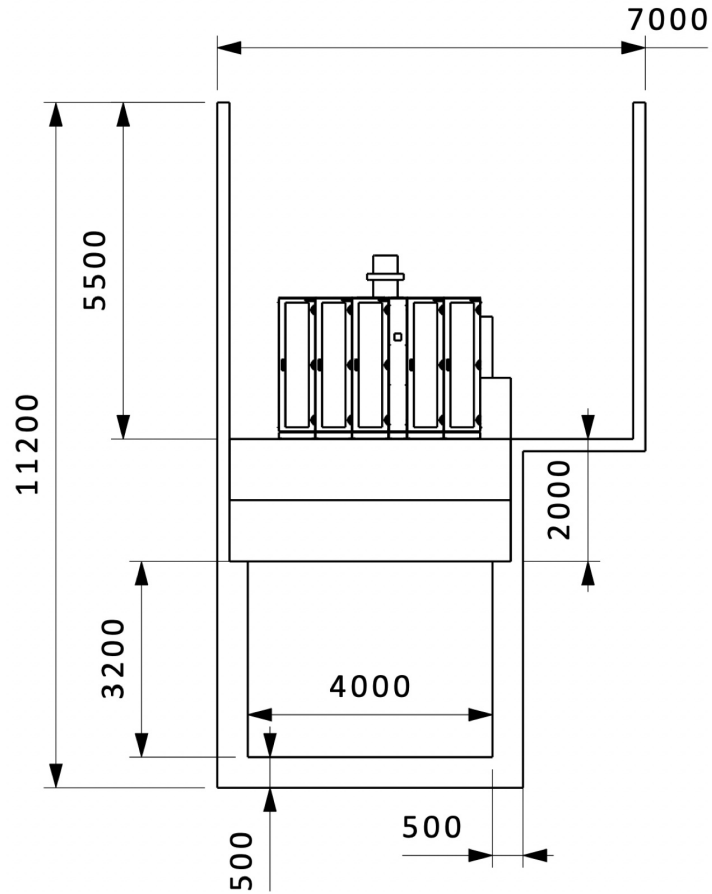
Draft 5.0 XLS Tunnel and Infrastructure Hall cross-section (1:100)
